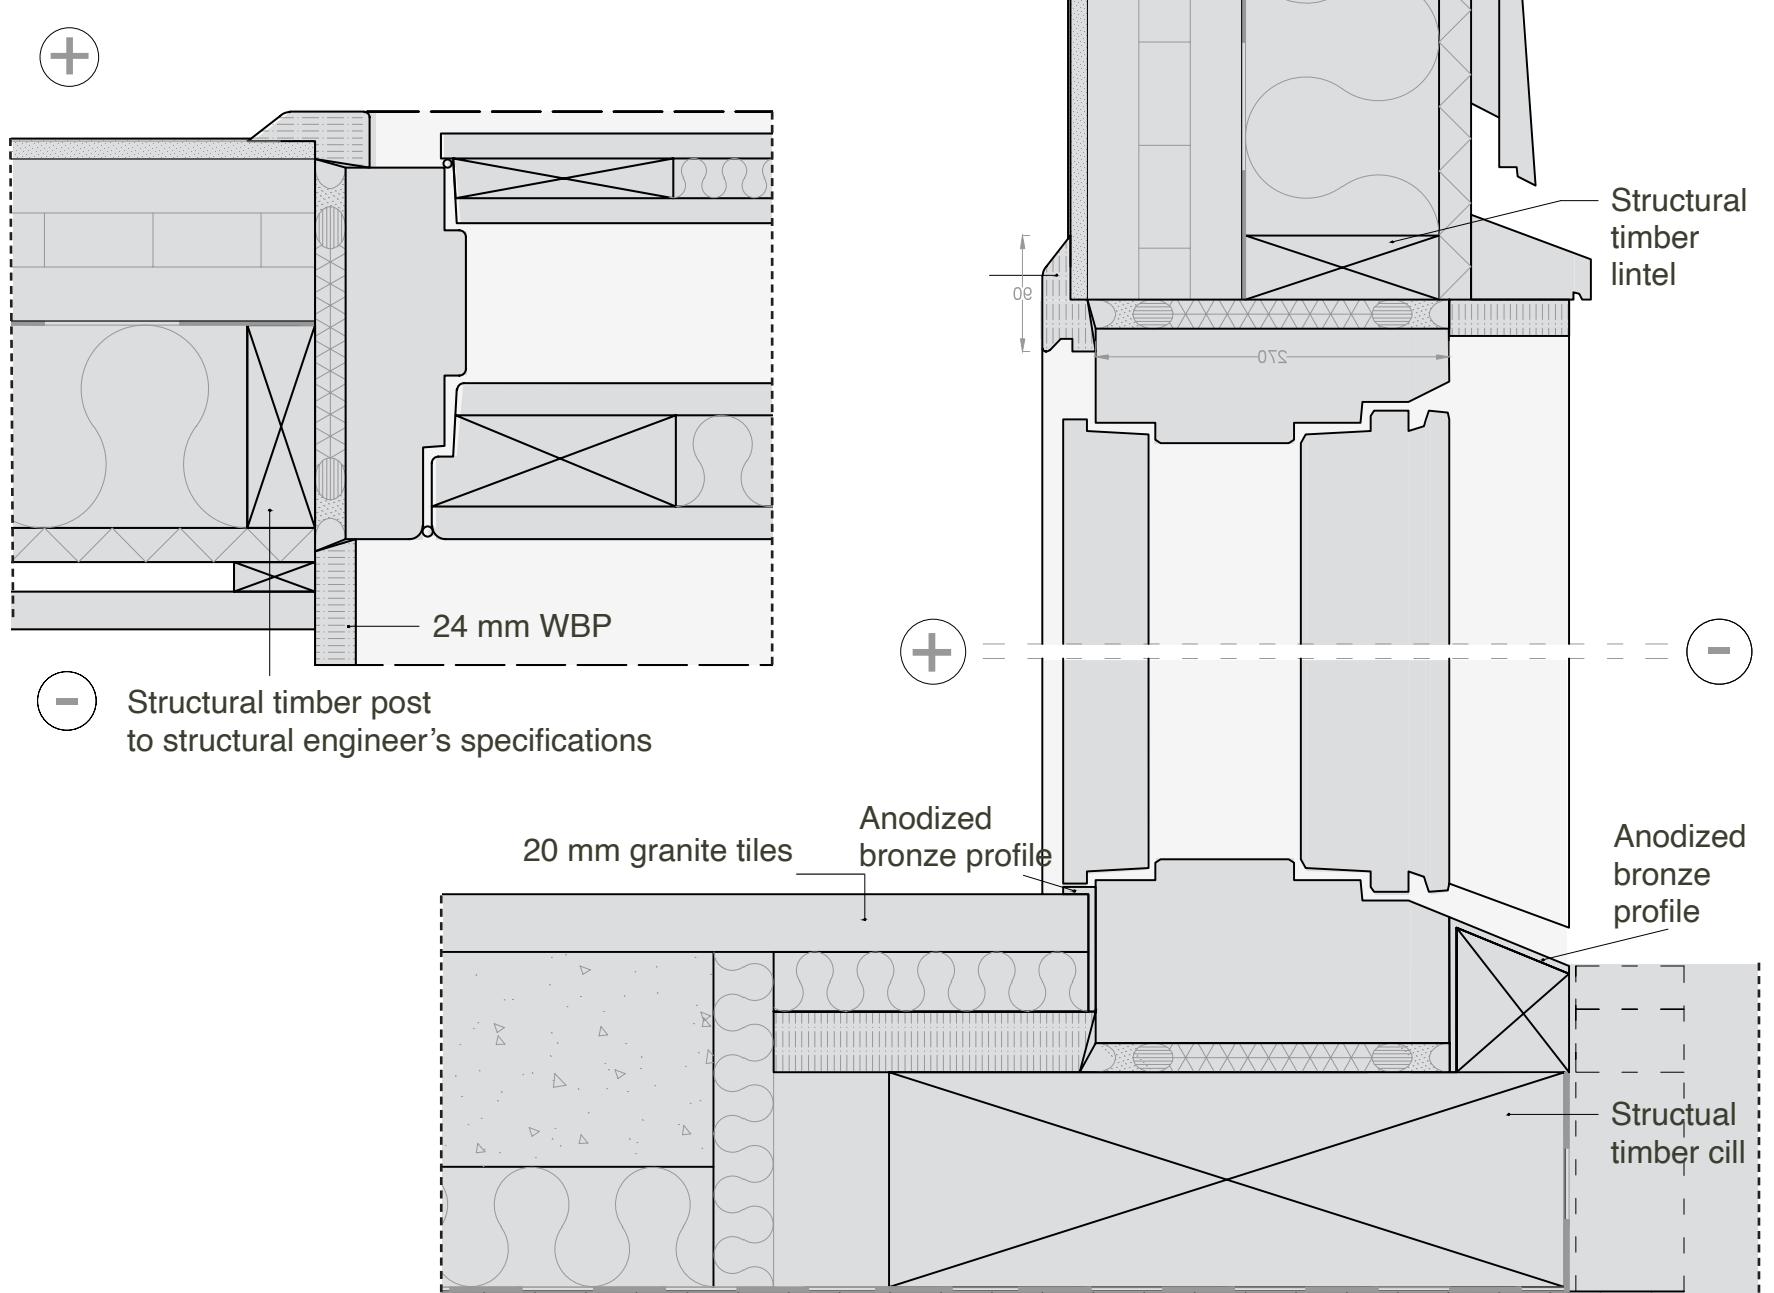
D01 fitting diagram, horizontal section on left, vertical section on right
